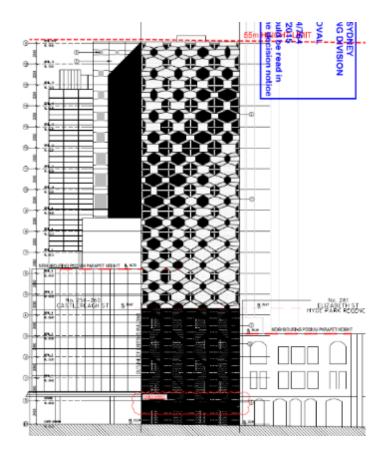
Castlereagh St (west) elevation approved under D/2014/764
